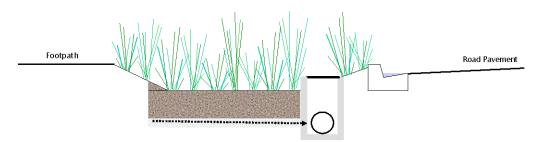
General Layout and Cross Section of Proposed Bioretention System
